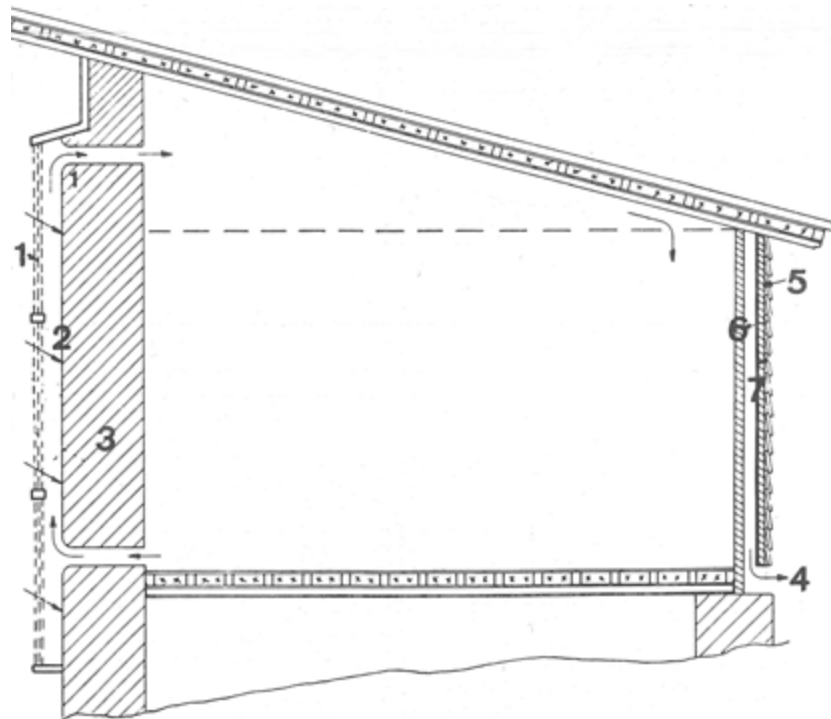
Section of prototype detached house built in Odeillo, French Pyrenees. One layer of glass covers the area of the wall intended to collect solar energy (1). The external surface of the wall (2) is painted black or very dark, roughcast or with an absorptive coating. The south wall (3) consists of a structural concrete wall that also functions as a heat store. Inlet on the north façade (4). The curved arrows indicate the flow direction. (Architectural Design, 10/1973)
